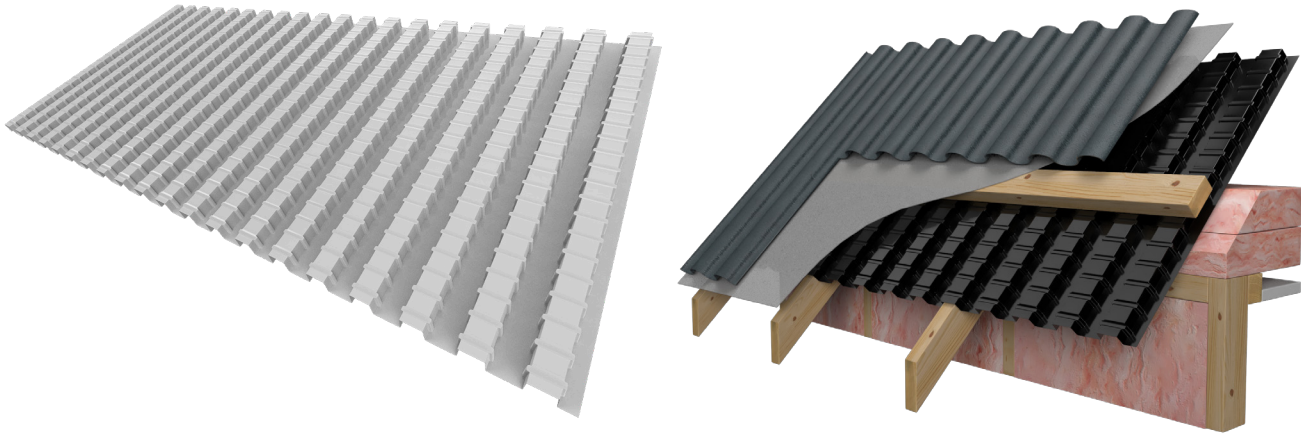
CL application with G2500N Over Fascia Vent, roof pitch >15°
